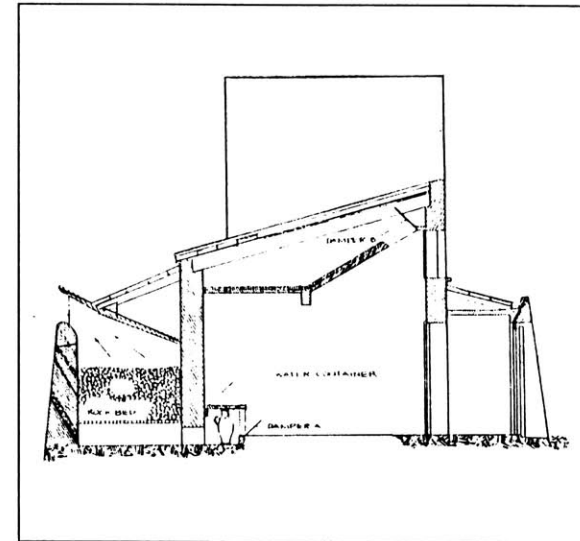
A Wind Tower Design Considered for a Settlement of Nomads in Central Algeria (Source : Bahadori,Ref. 28).
